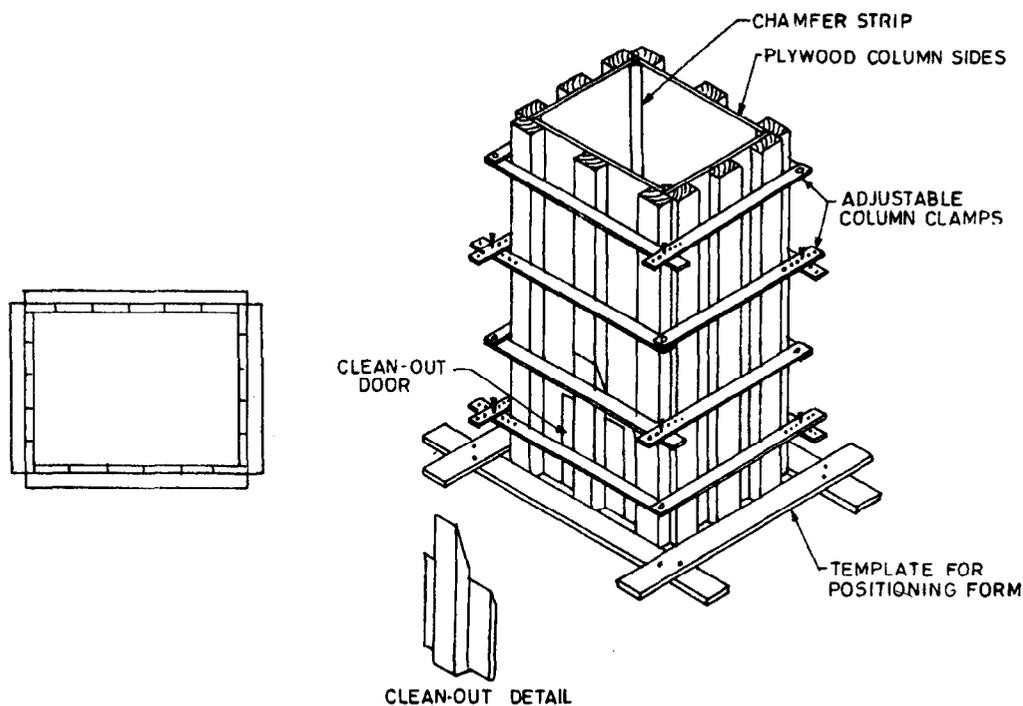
TYPICAL CONSTRUCTION OF HEAVIER COLUMN
